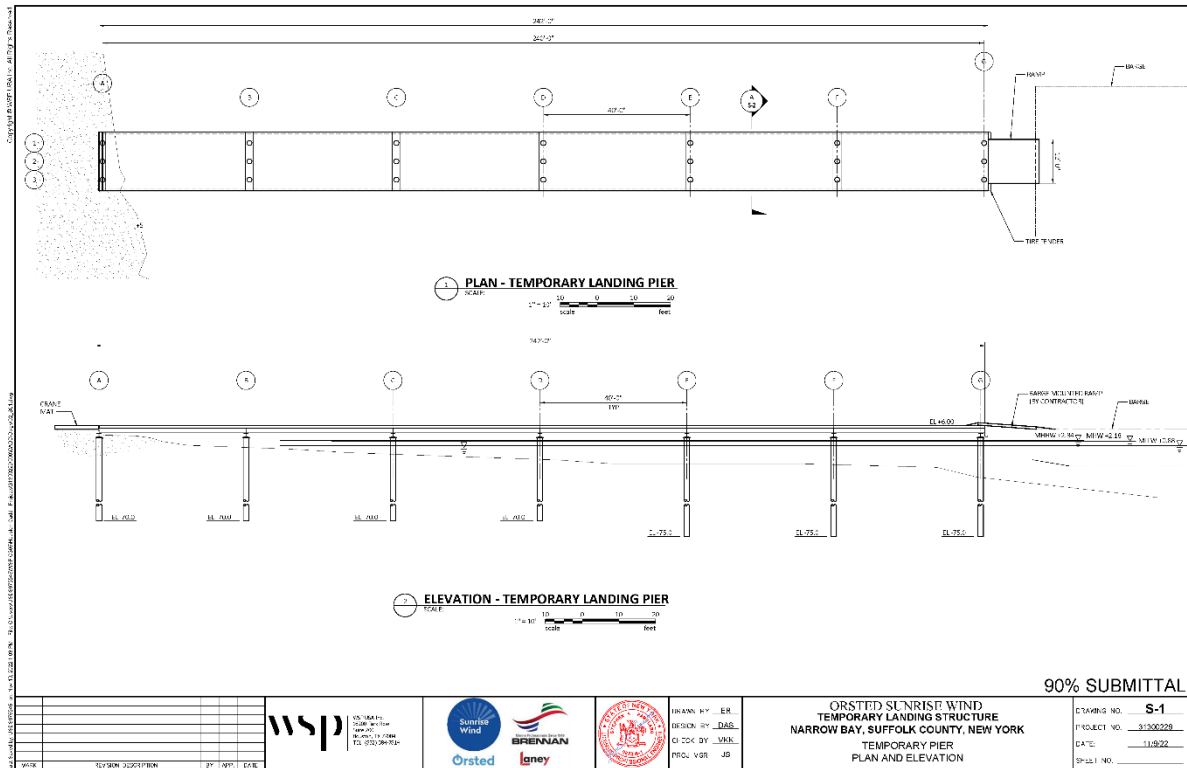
Preliminary Plan and Elevation Details for the Temporary Landing Structure
